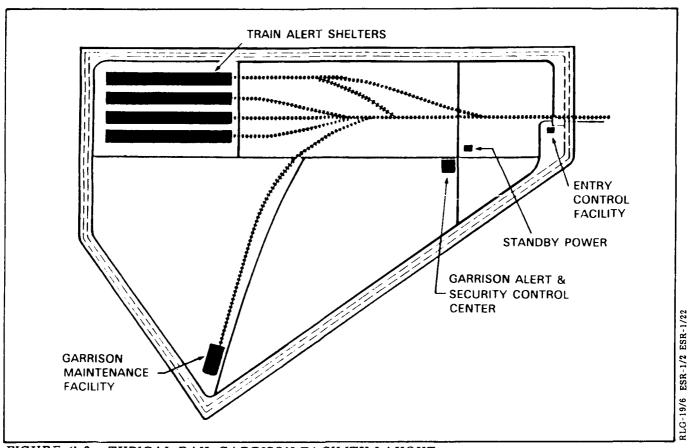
TYPICAL RAIL GARRISON FACILITY LAYOUT
